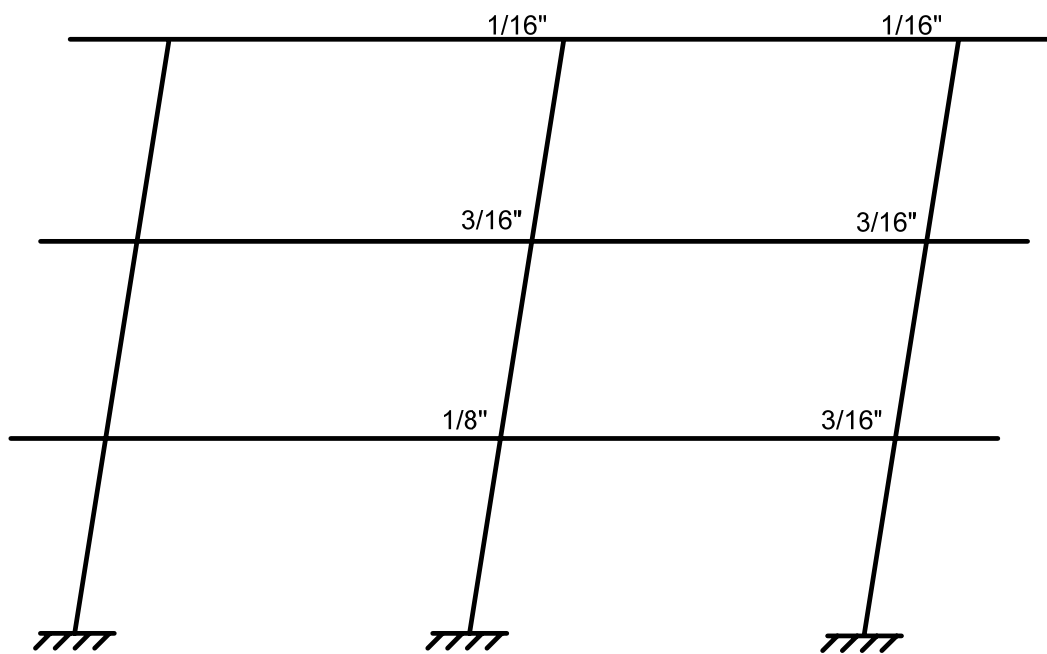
Flexural Crack Widths Frame A, North 3% Roof Drift
